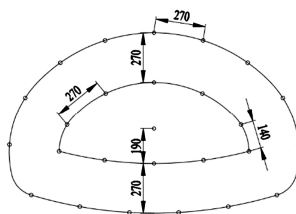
Arrangement of Alkali injection holes on the working face (units: cm)
